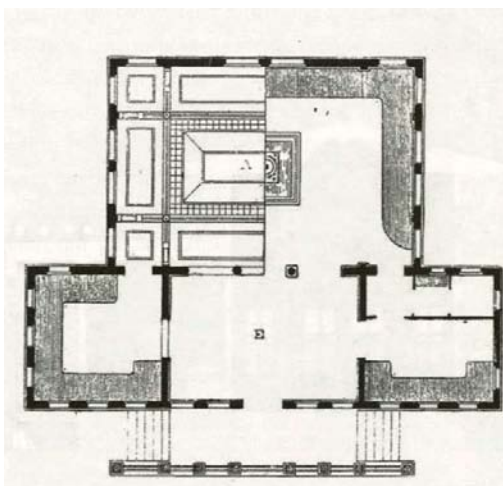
Parvillee, plan of the Pavillion du Bosphore, Paris, 1867.
